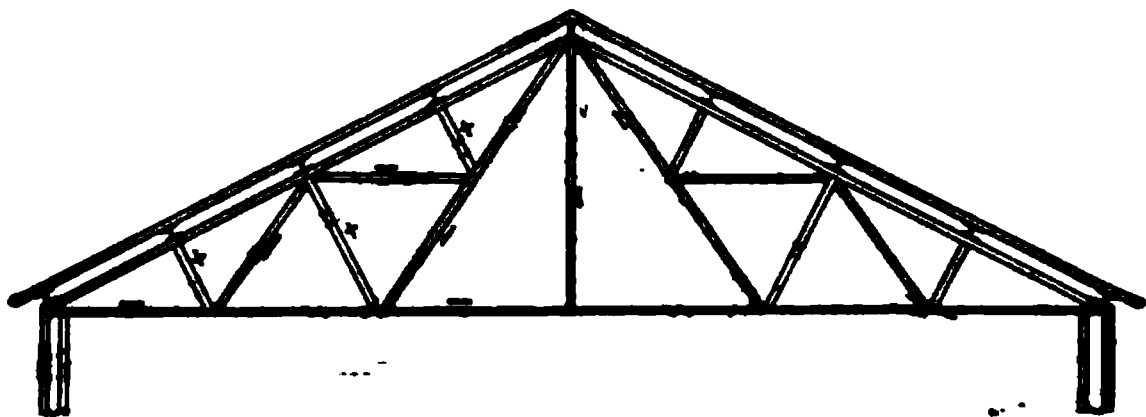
Fink Truss. Spans from Forty to Eighty Feet
